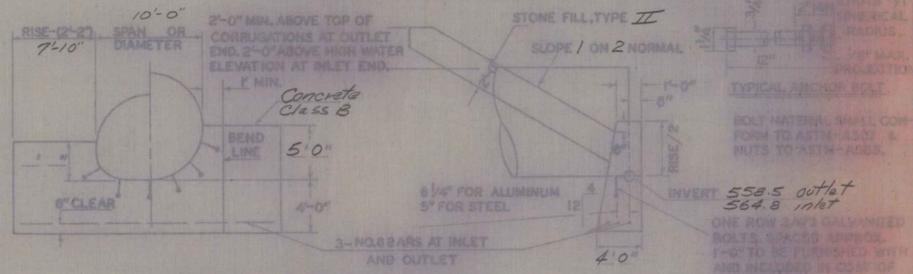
DETAILS OF STRUCTURAL PLATE PIPE CULVERTS
